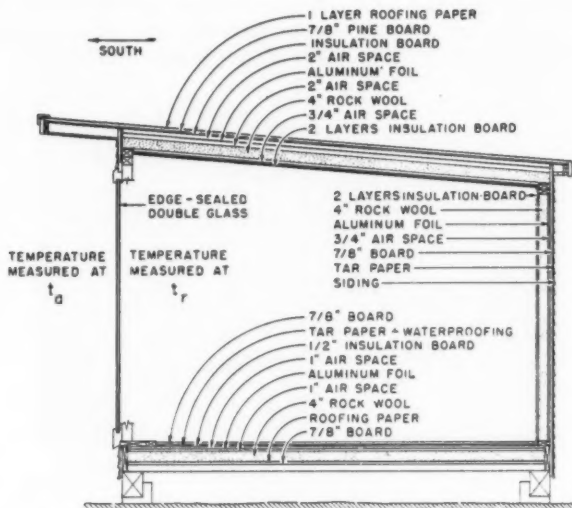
CROSS SECTION OF TEST HOUSE SHOWING CONSTRUCTION
